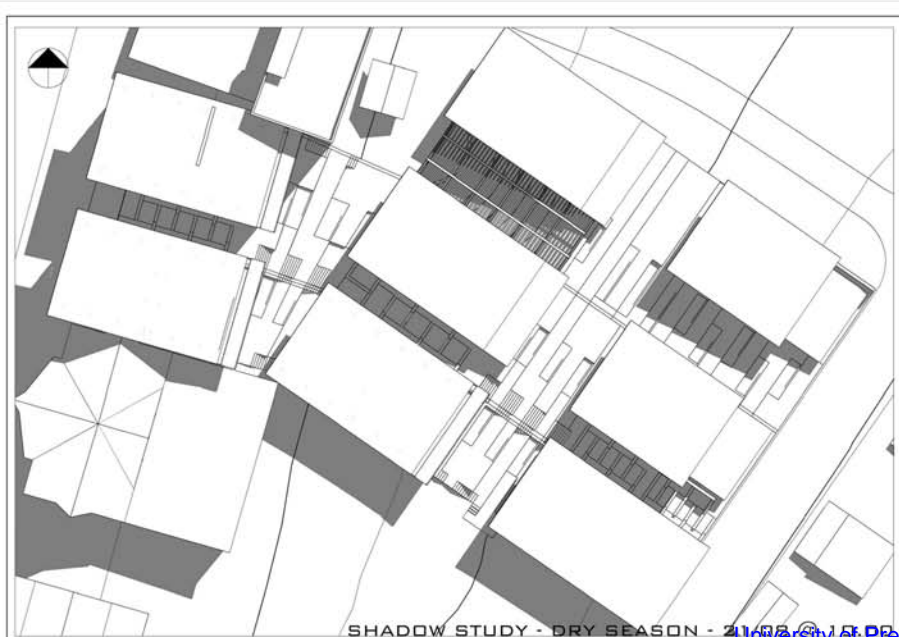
SHADOW STUDY ON 21 AUGUST AT 10.00 - SITE PLAN (AUTHOR, 2006).
